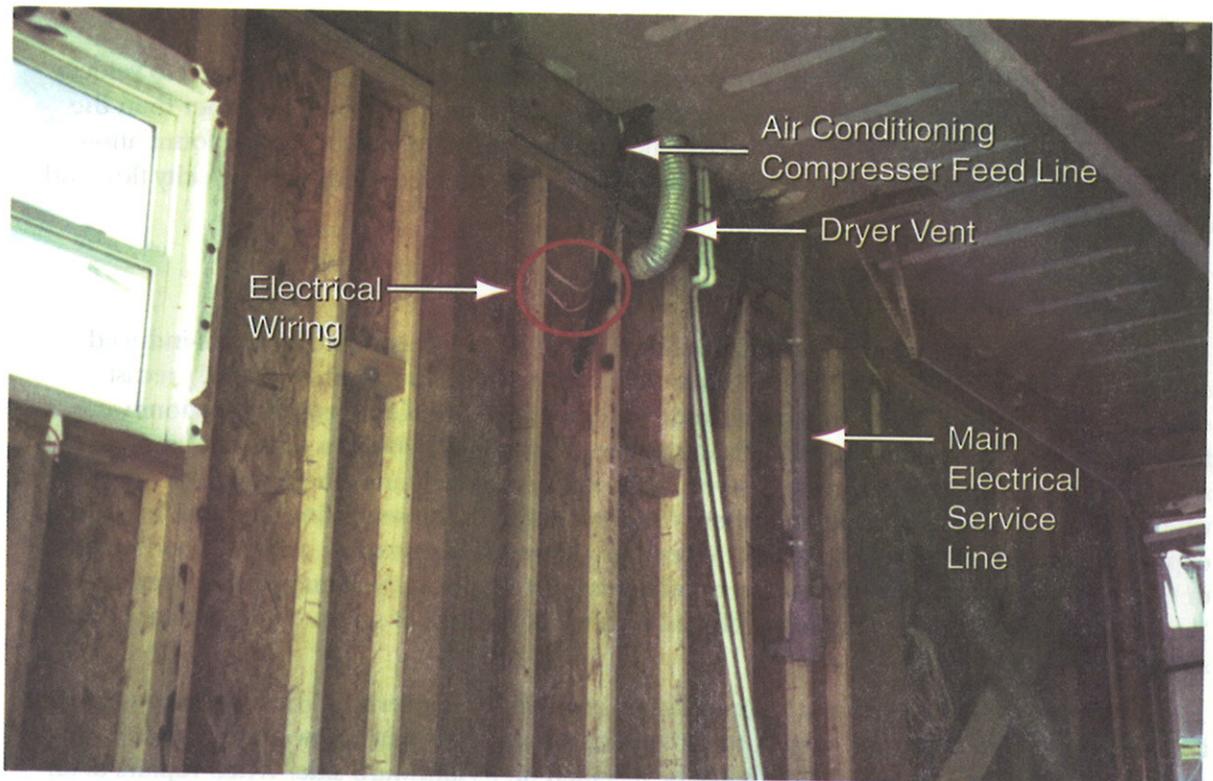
Utility components (dryer vent, air conditioning compressor feed line, main electrical line out of meter box, and electric wiring) penetrating breakaway wall panel.
